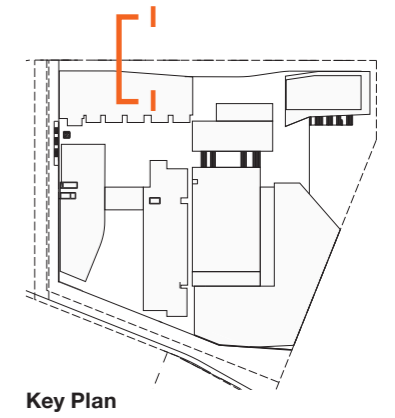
Vehicular entry - Part North Elevation
